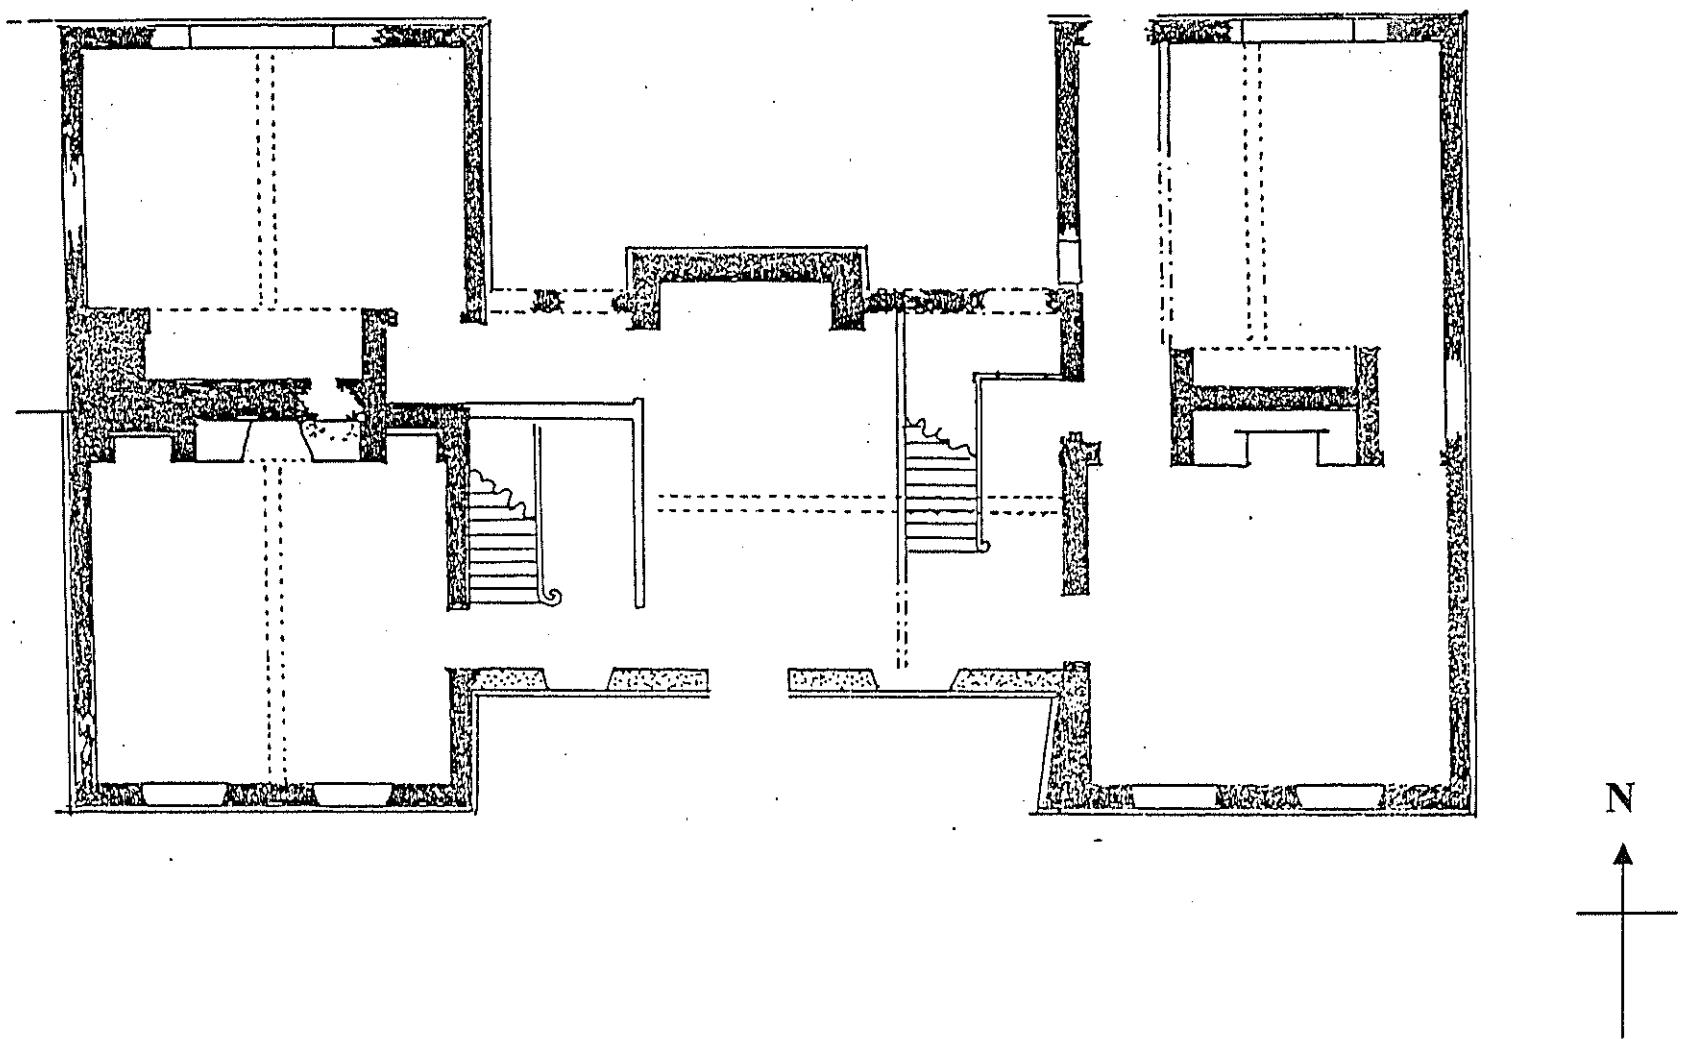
Plan at attic level to show approximate position of roof and floor-frame timbers sampled
